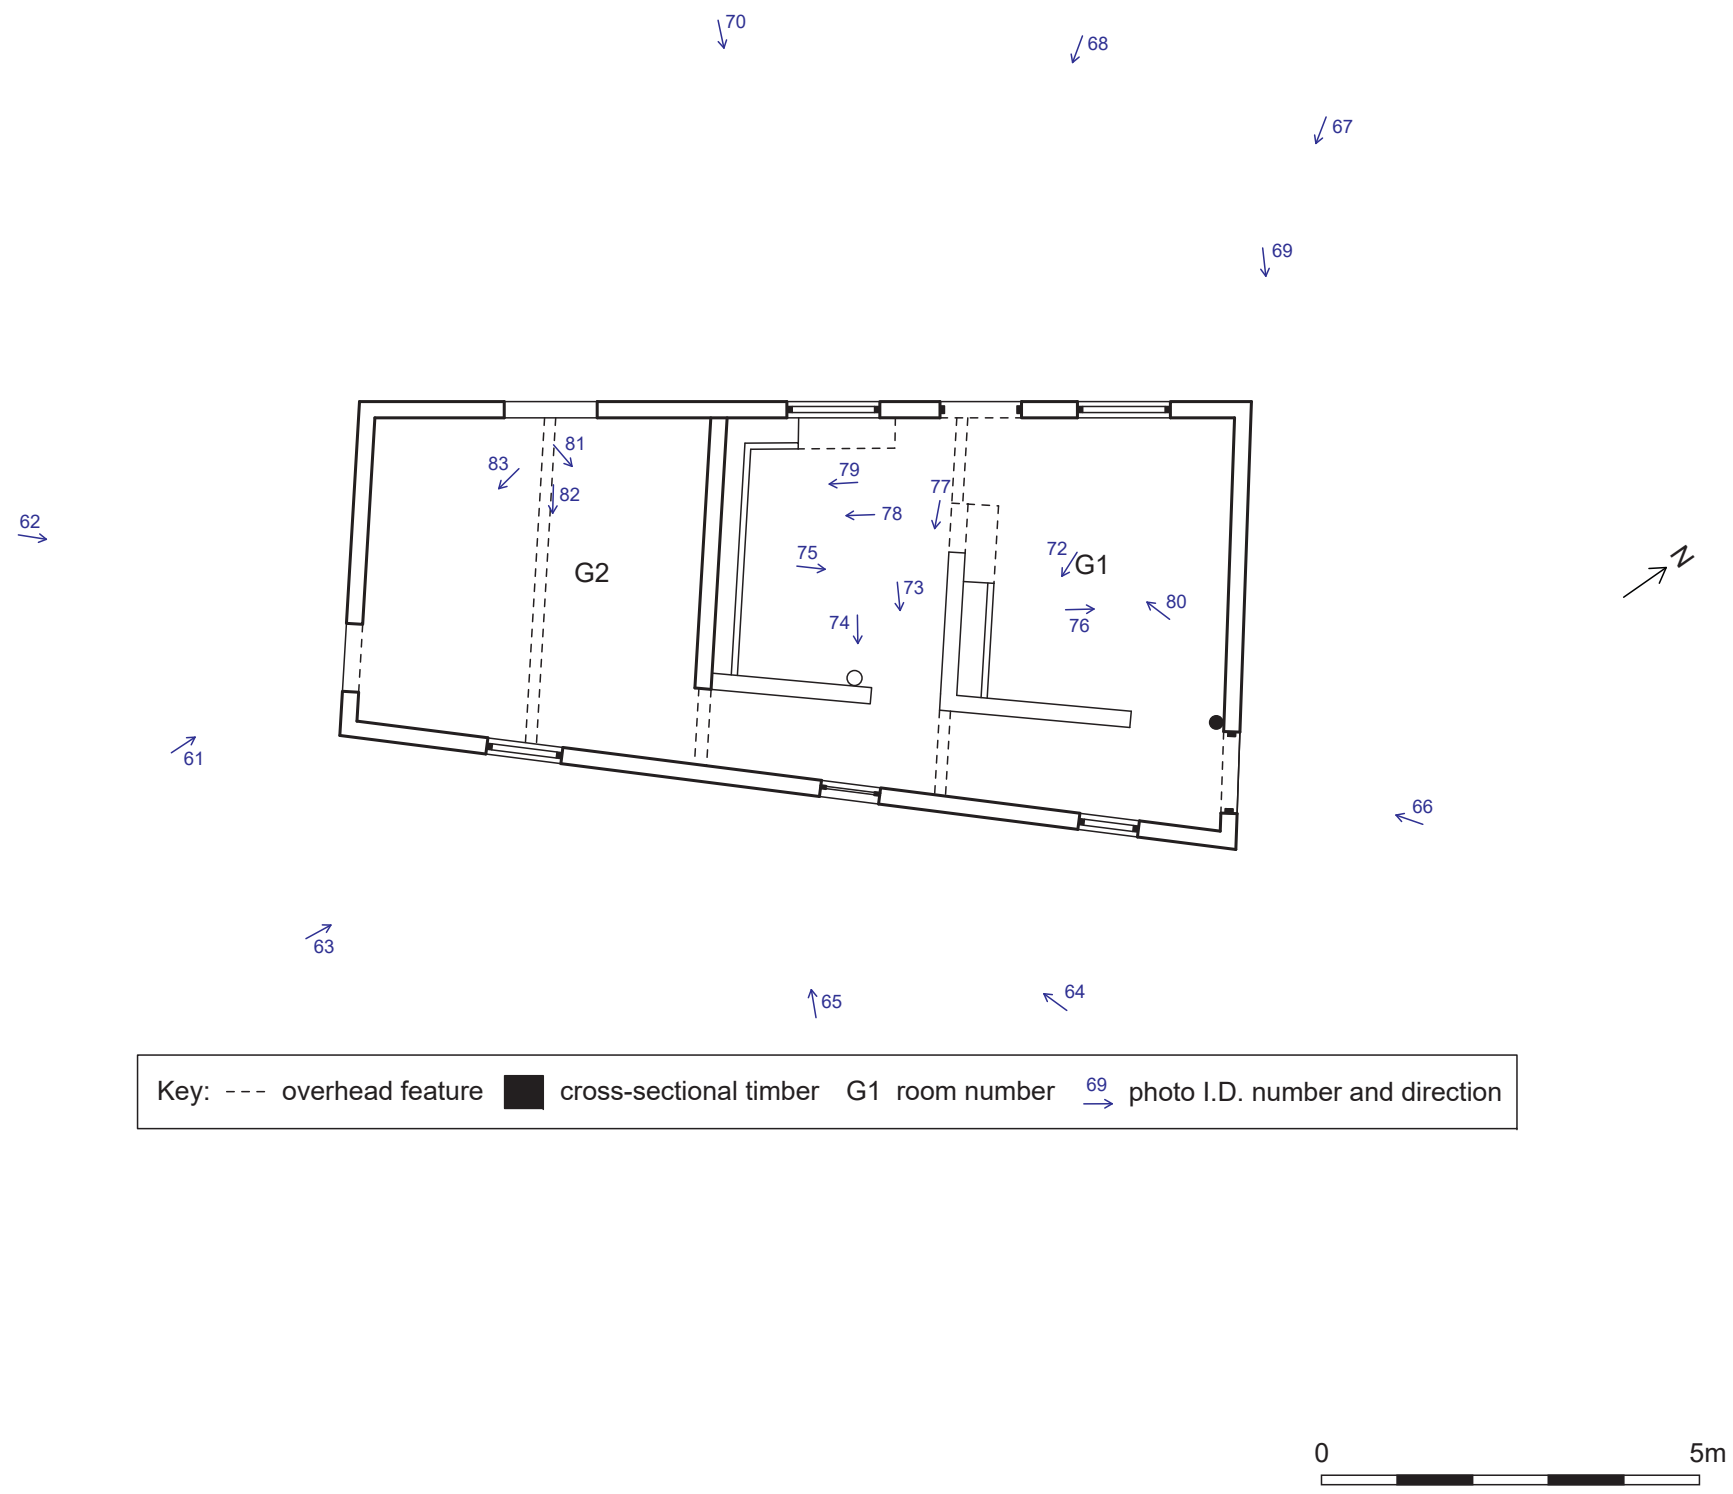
Ground floor plan of Outbuilding 1, showing the location and direction of photographs taken
